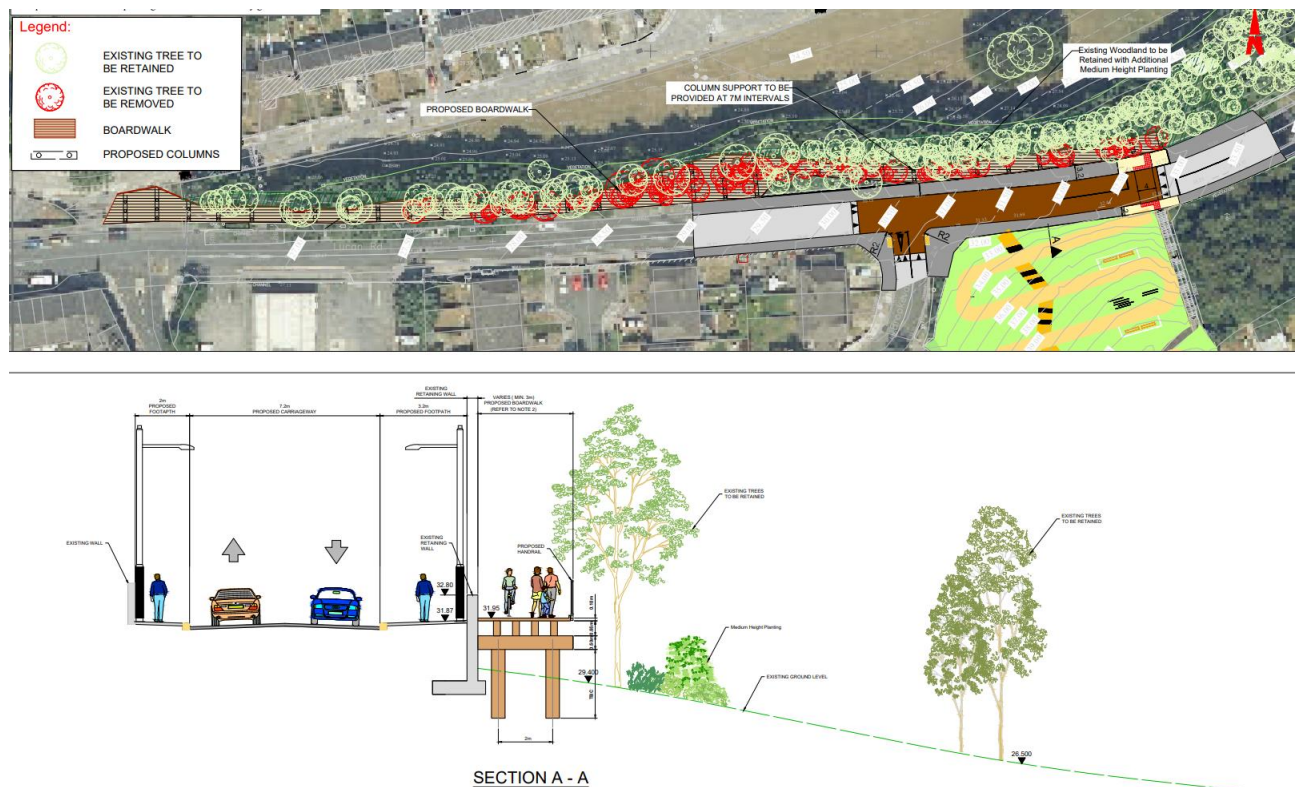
Proposed Boardwalk Structural Layout and Cross Section
